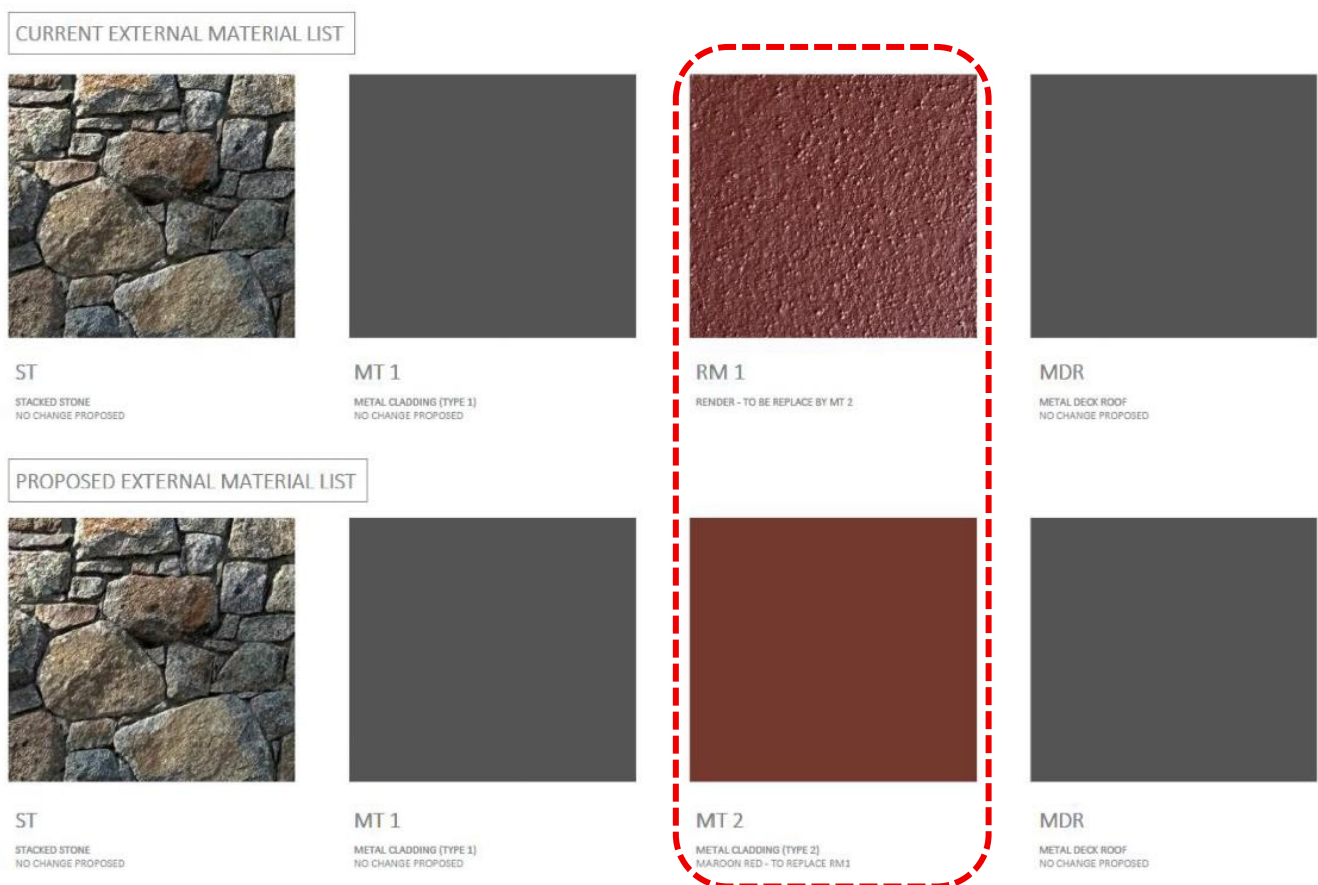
| Building materials and finishes existing and proposed (Source: Applicant's documentation)
